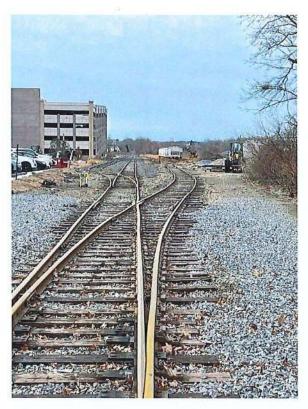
Railroad tracks looking southwest from Maplewood Ave. Taken 1/19/23
